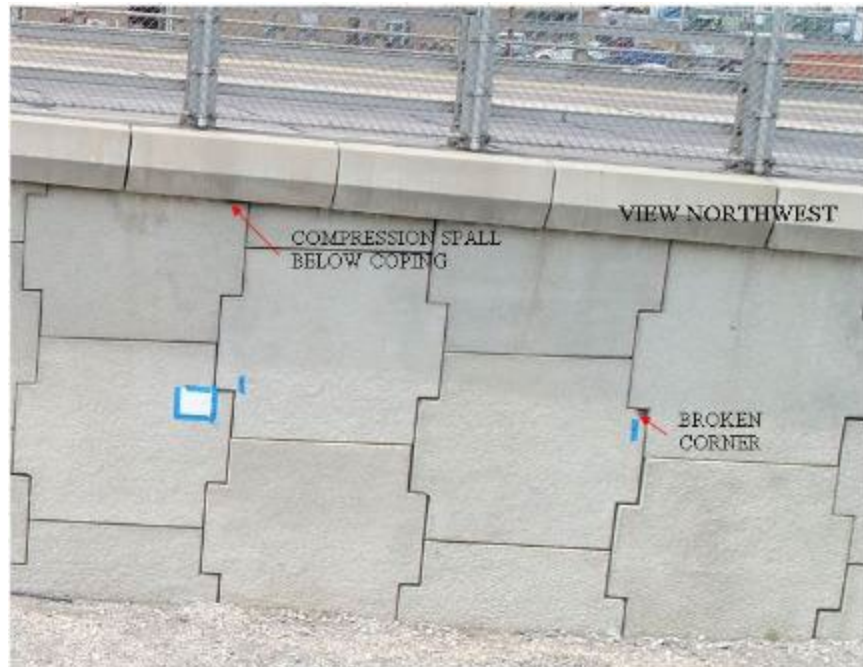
Broken Corner at STA 01+10, Gould Street Overpass, Wall 4
